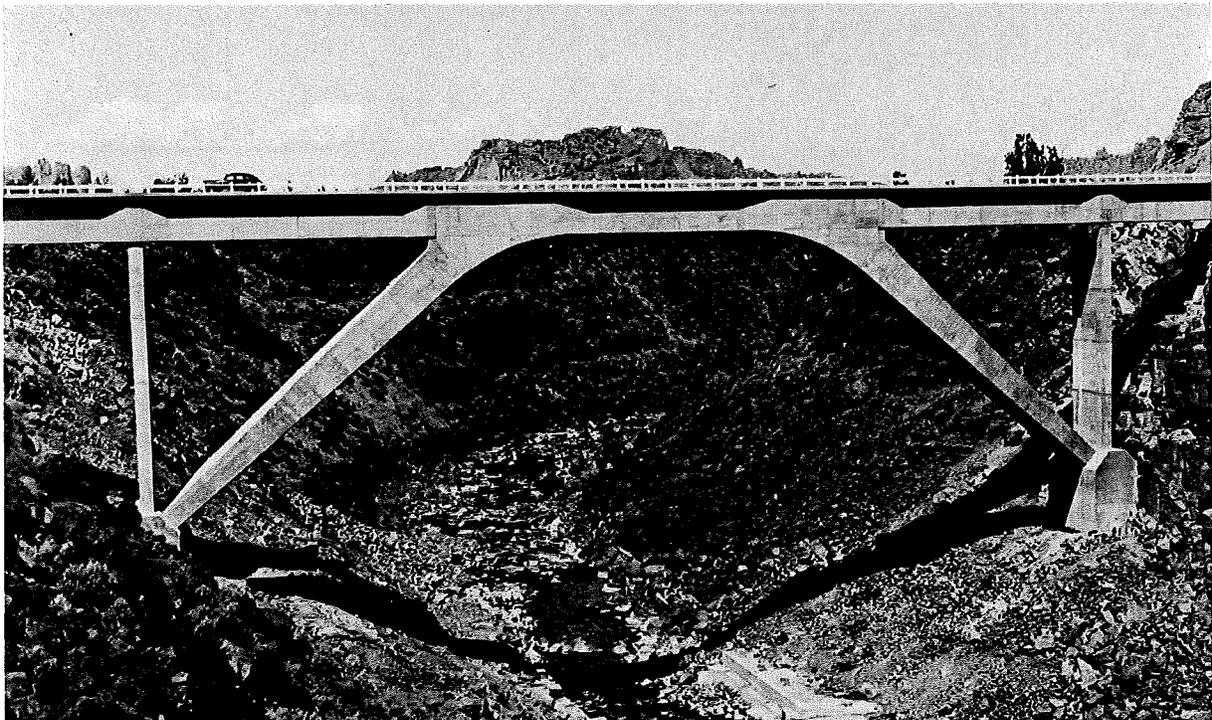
North Unit Main Canal Crooked River Crossing. View of completed structure looking downstream from south rim of canyon on July 13, 1946. Reclamation photograph Deschutes 470.
